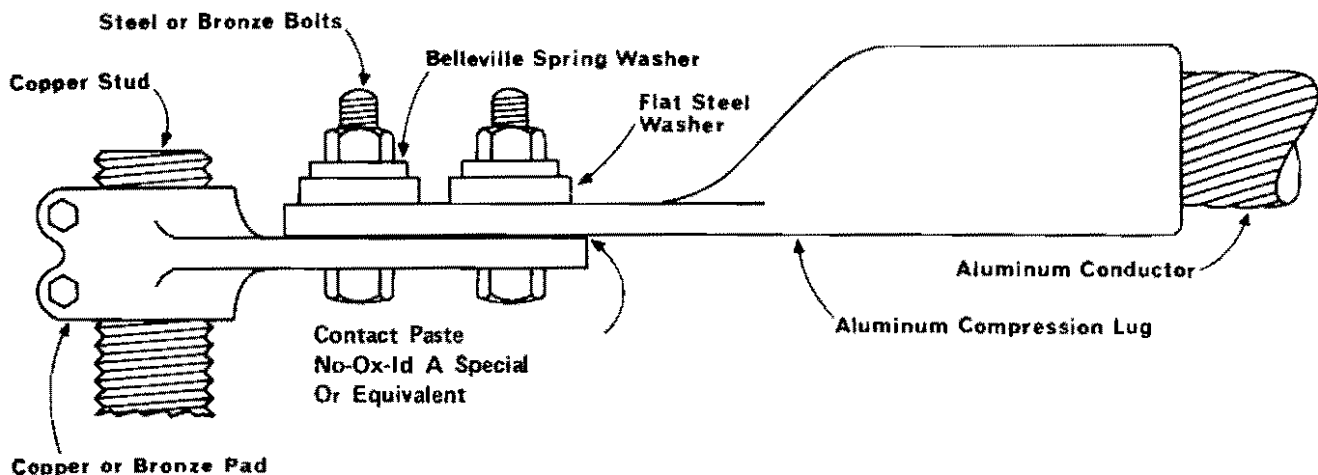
Method for connecting large aluminum conductors to equipment studs or terminal pads made of copper. If bolts are made of aluminum it is not necessary to provide the Belleville spring washer.
